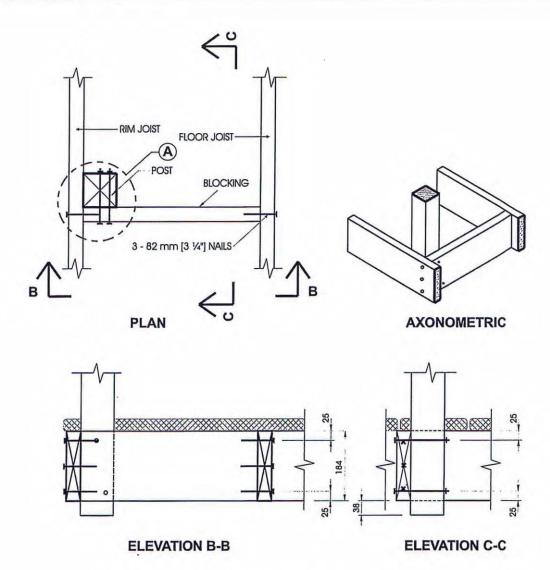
Exterior Connection: Post Bolted to 2 Floor Joists
